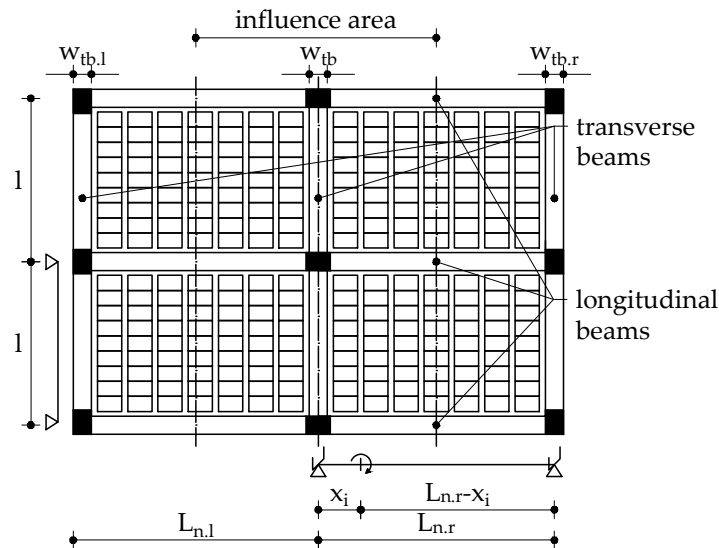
Carpentry plan of a generic building with 3D spatial frames
